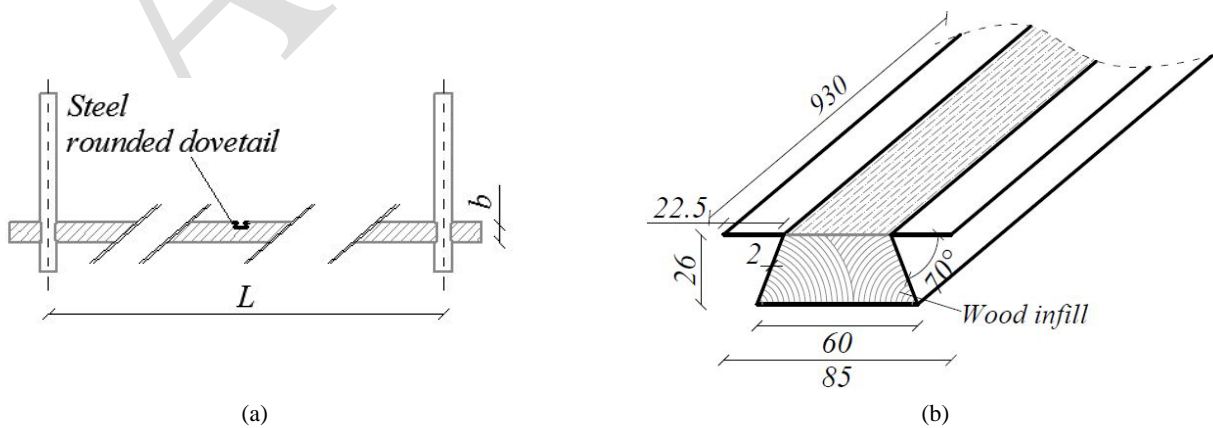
Specimen W02 with 'Standard' corner joints and mid-span steel rounded dovetail profiles. (a) top view of specimen; (b) cross-section of steel profiles (nominal dimensions in mm).
